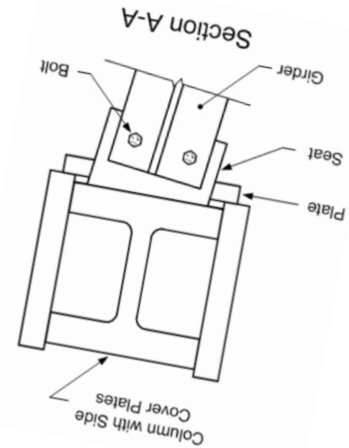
Plan View at Floor 13, Column 79 Seated-Beam Connection
